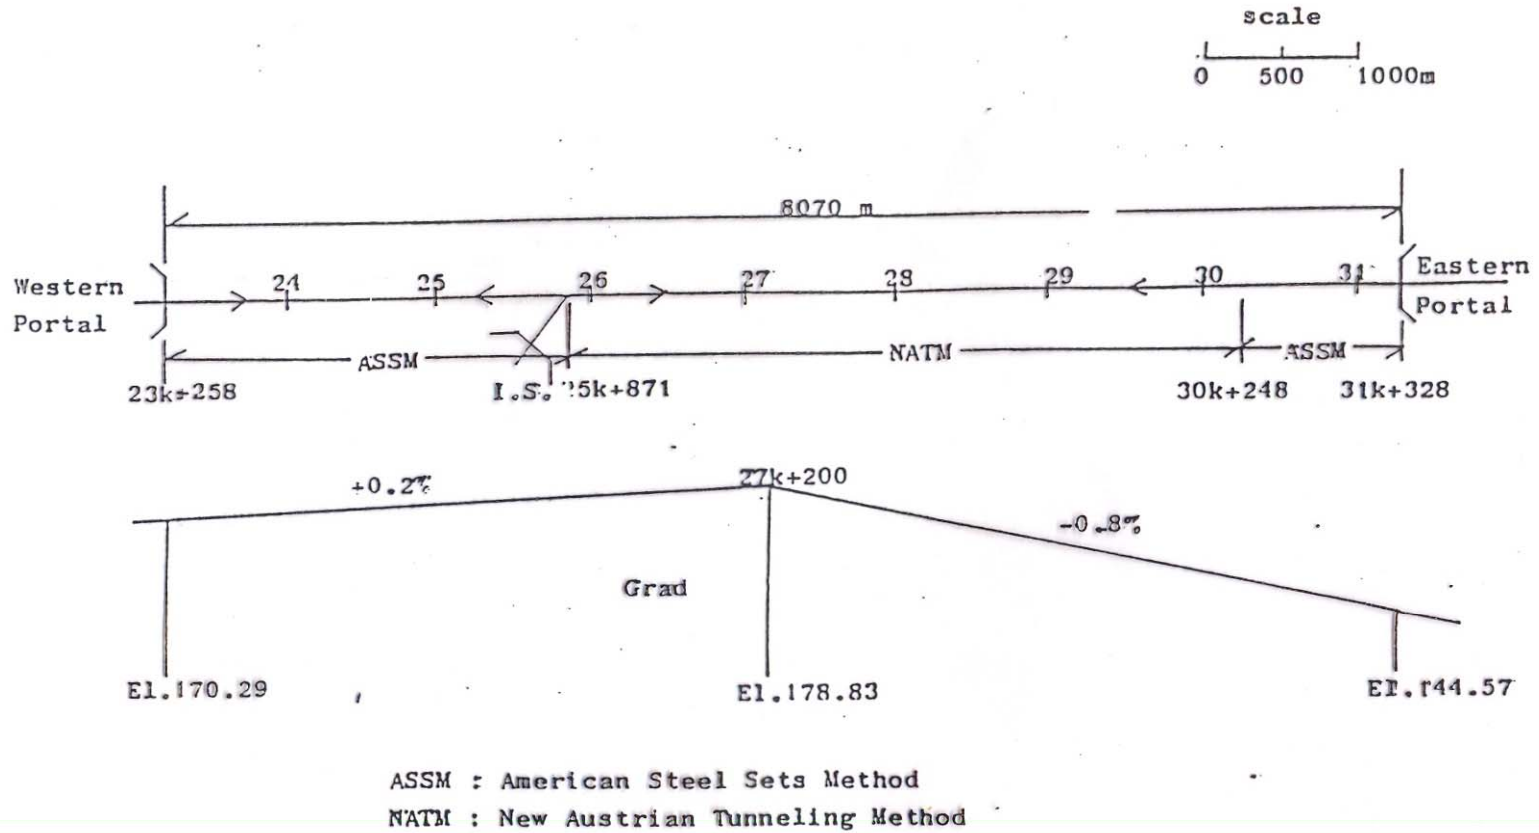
Layout of Construction Methods along The Central Tunnel, Length and Elevation
